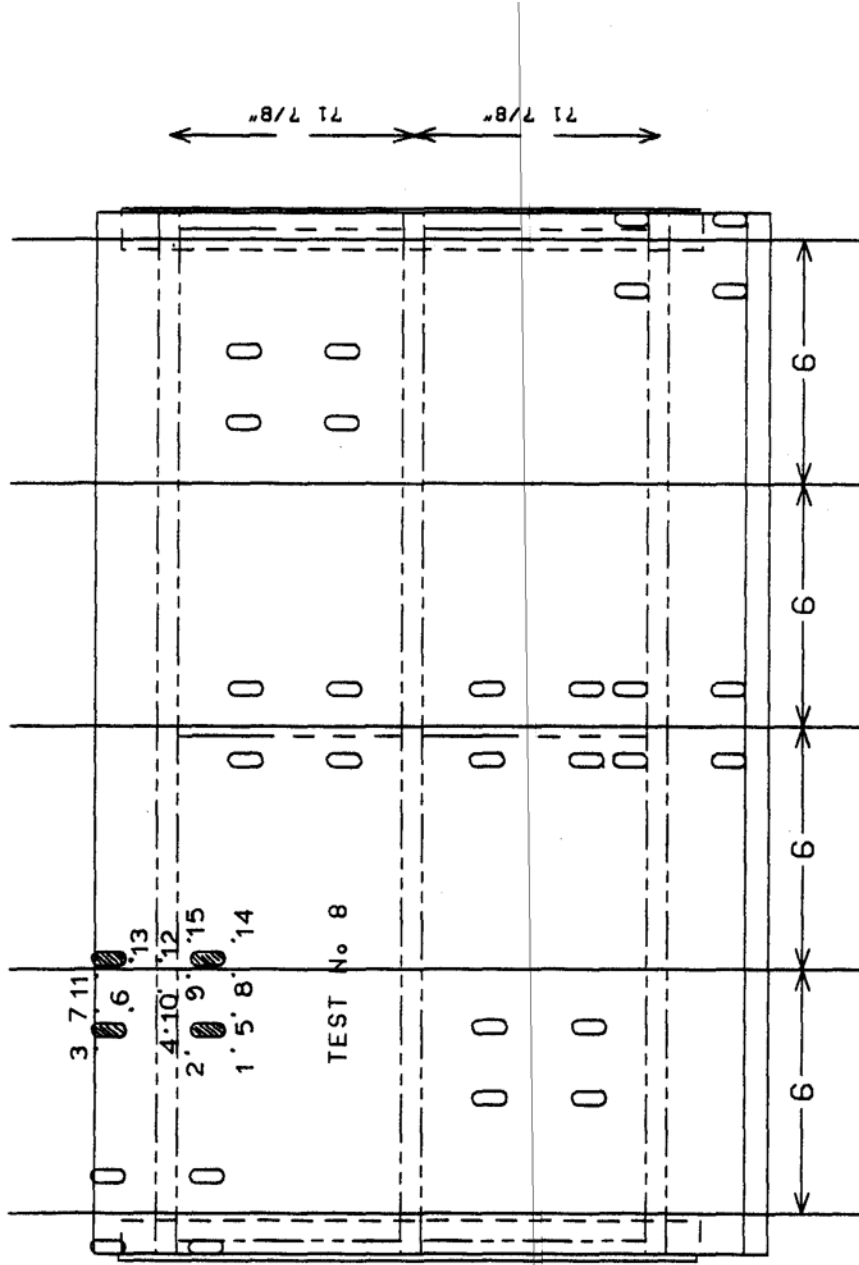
LVDT Locations (Third Bridge - Test No. 8)
